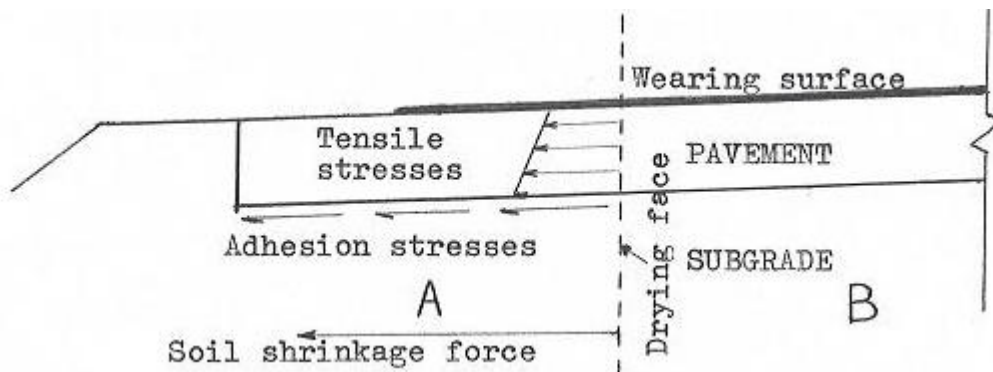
Stresses created on pavements from shrinking soils . (Marangelli 1973)
